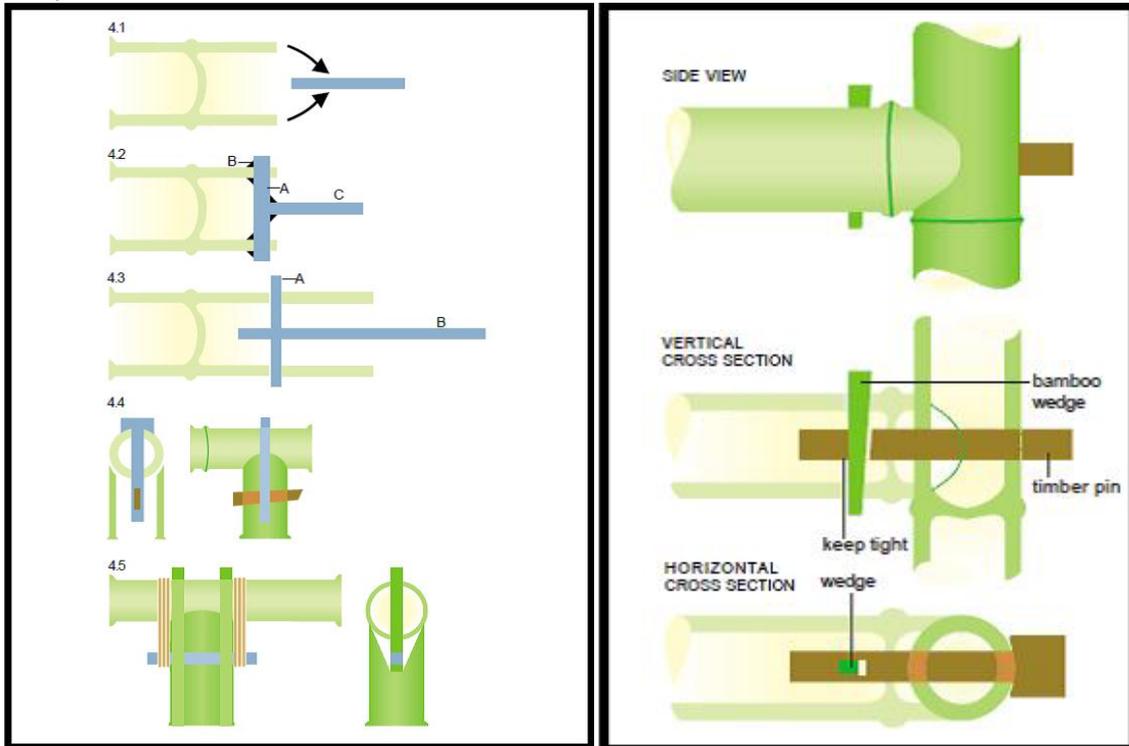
Joints from cross-sections to an element parallel (Janssen, 1981).
